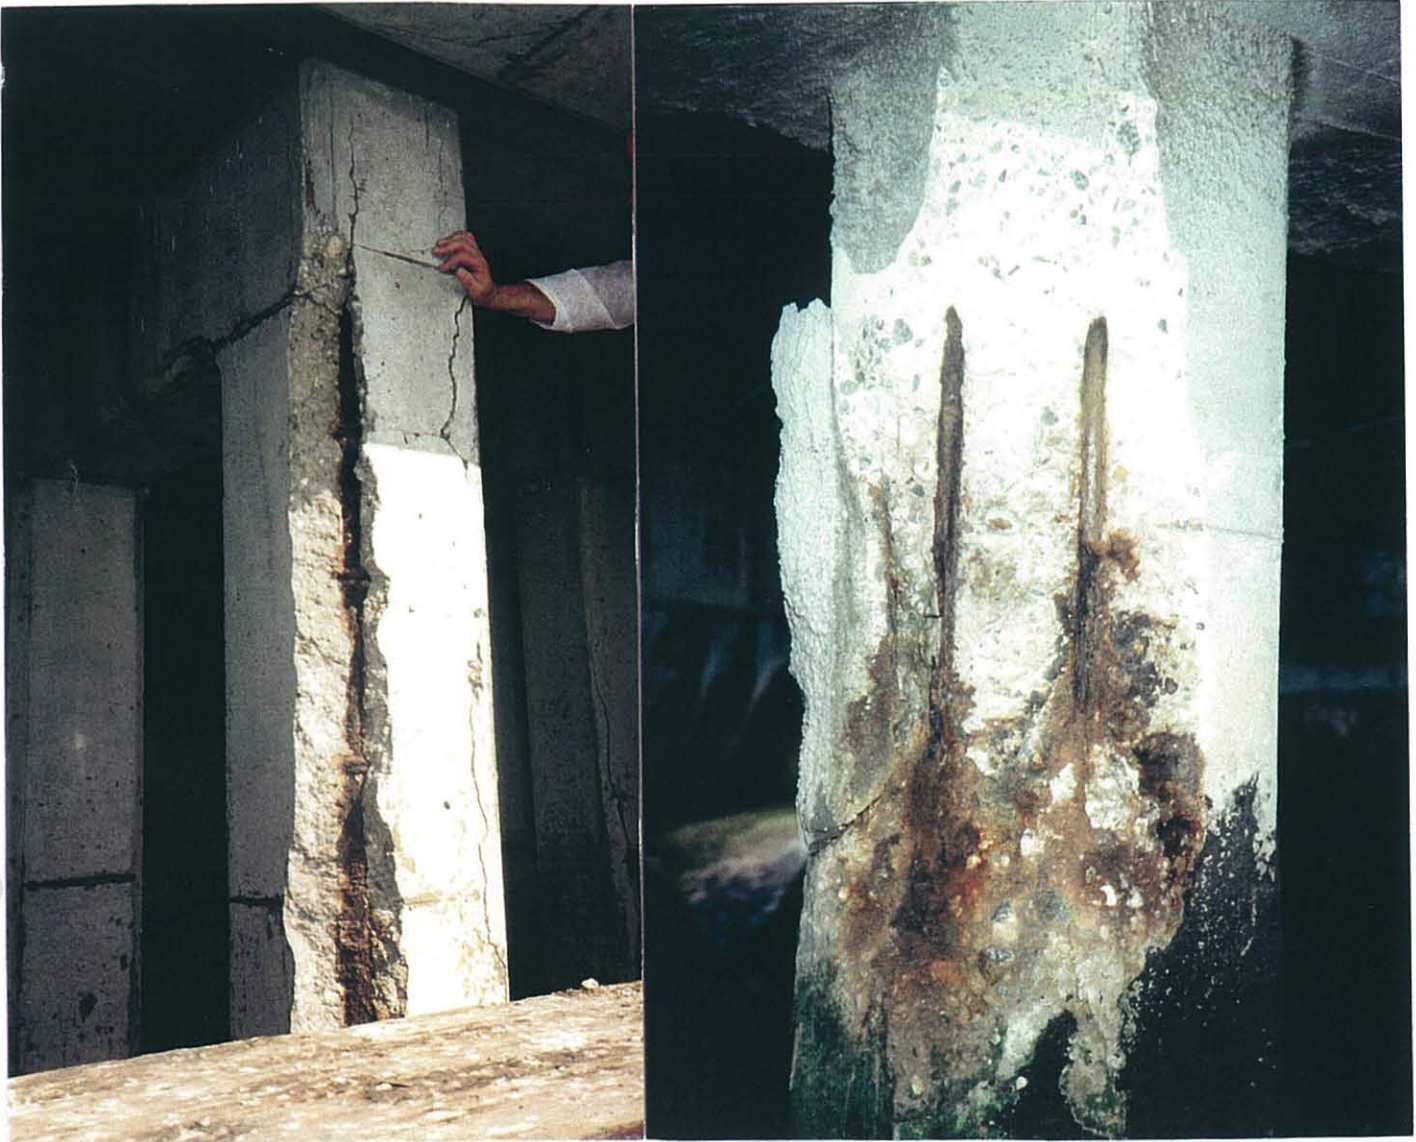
Open spalls at corners of concrete piles. Left photo shows exposed corner bar, while right photo shows spall spreading over two adjacent sides of pile.
